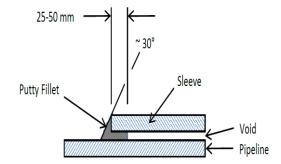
Epoxy-grouted Sleeve (Type A)-Sleeve Side view A cylindrical steel sleeve with a longitudinal seam weld but no welds at the ends. Imagine a half-pipe wrapped around the damaged area.
